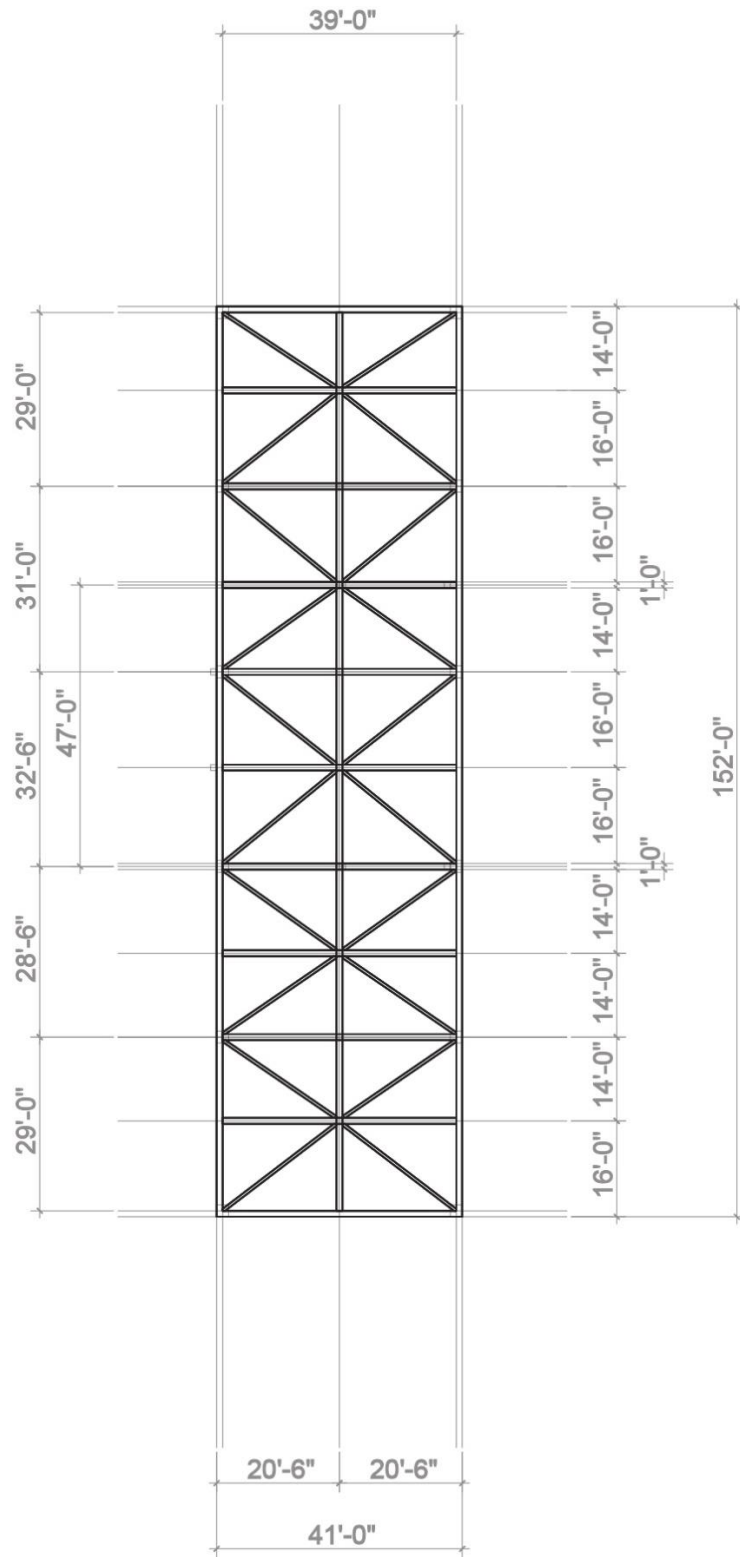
Plinth (platform) transfer beams and diagonal bracing overlaid on modular gid.
